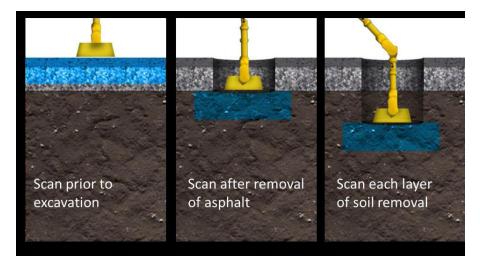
Below-Ground sensing conducted in layers throughout the excavation process
